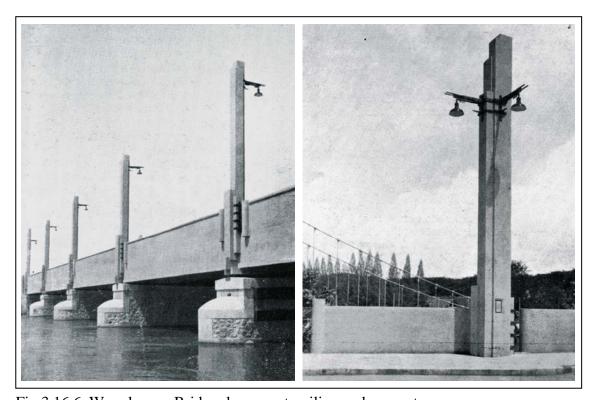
Wonokromo Bridge: lamp post, railing and support.
